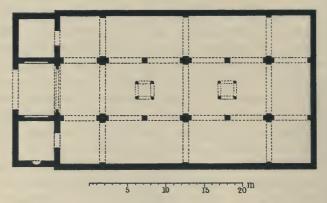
ISSIZ KHAN: SKETCH PLAN.
